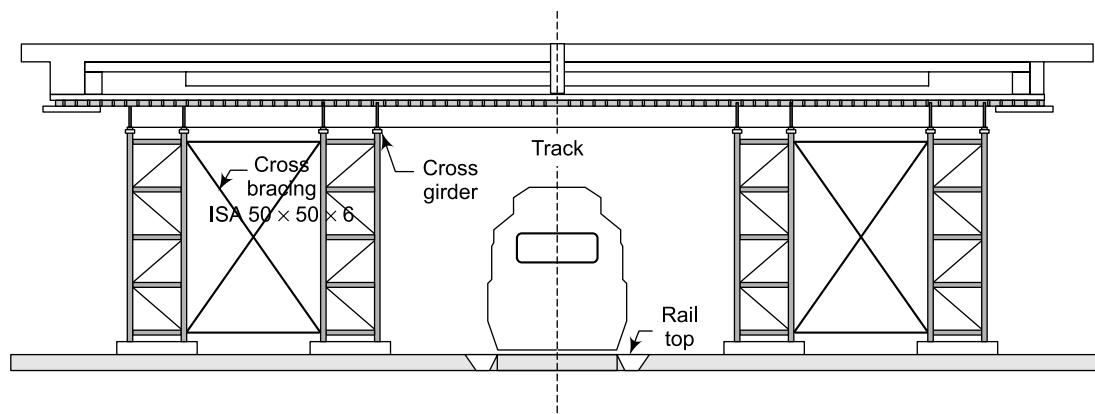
Arrangement of Trestles for Supporting Girder and Slab for ROB.
